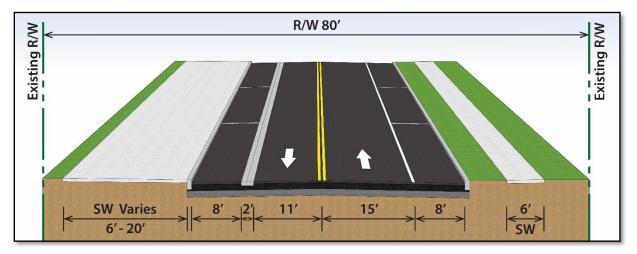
Existing Typical Section – Whiting Street – Jefferson Street to Selmon Expressway
